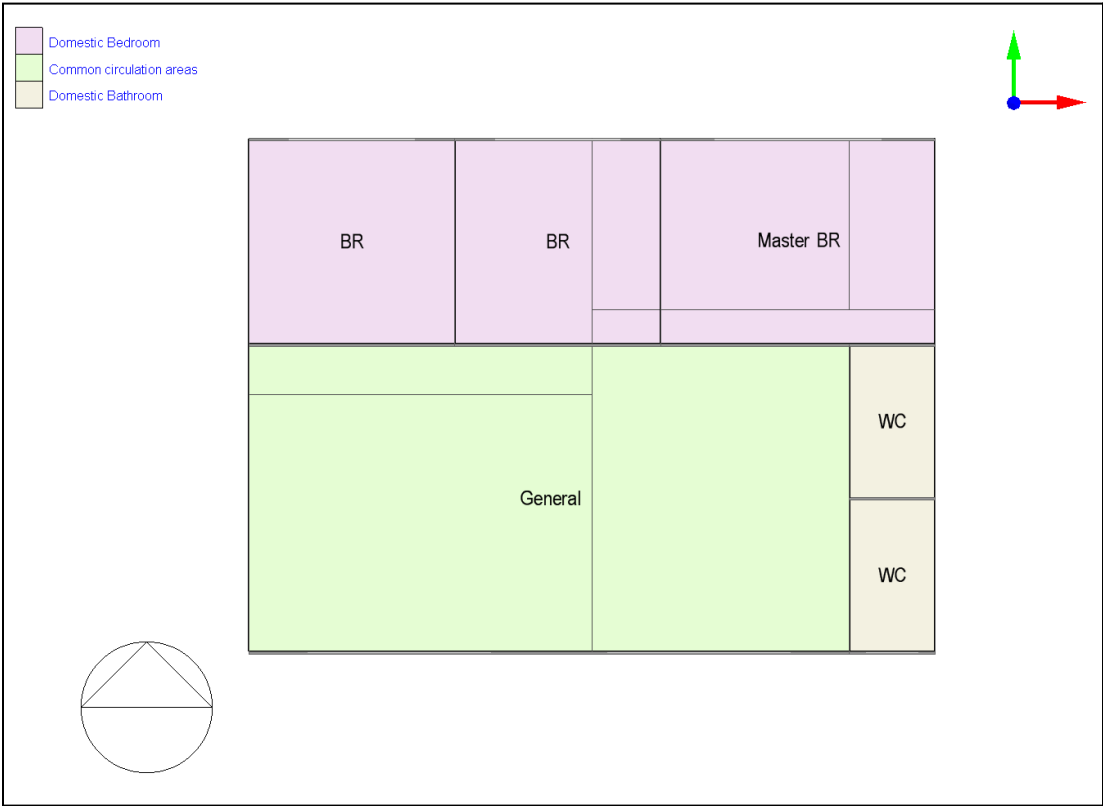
Second Floor Plan of Single Family Home in Los Angeles, CA
